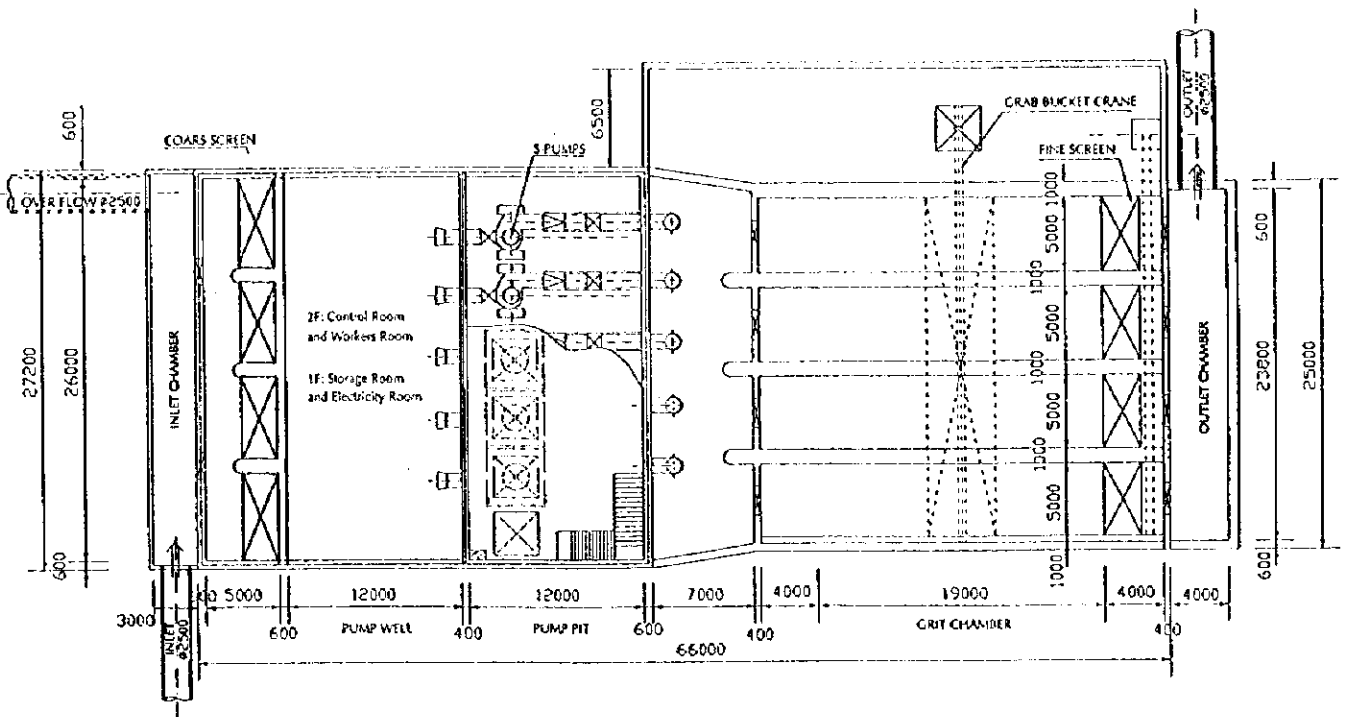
LAYOUT OF INTERMEDIATE SEWERAGE PUMPING STATION
